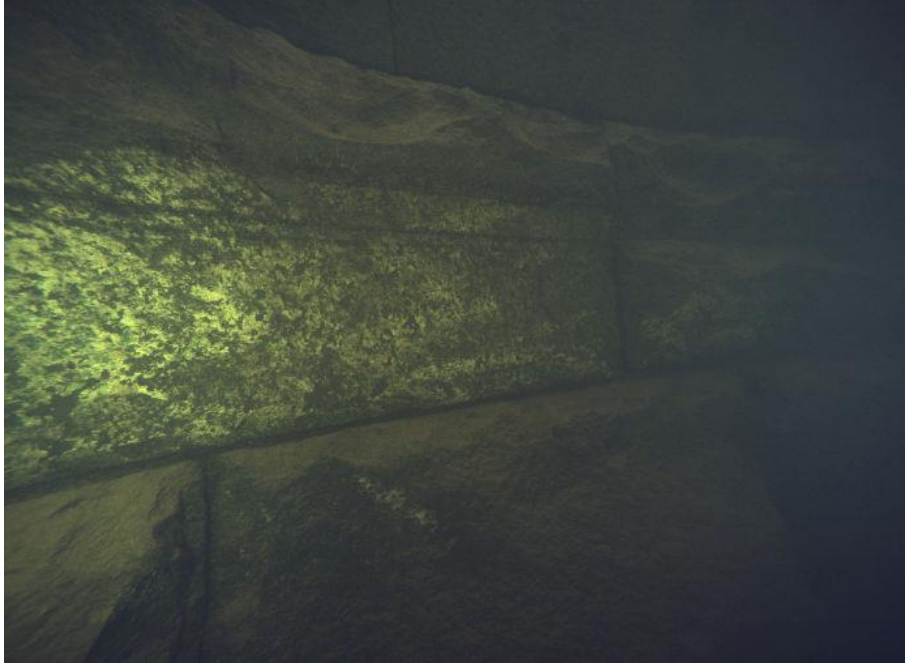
Inspection video of outlet tower/dam wall interface ([click here](#) or on the image above to launch).
